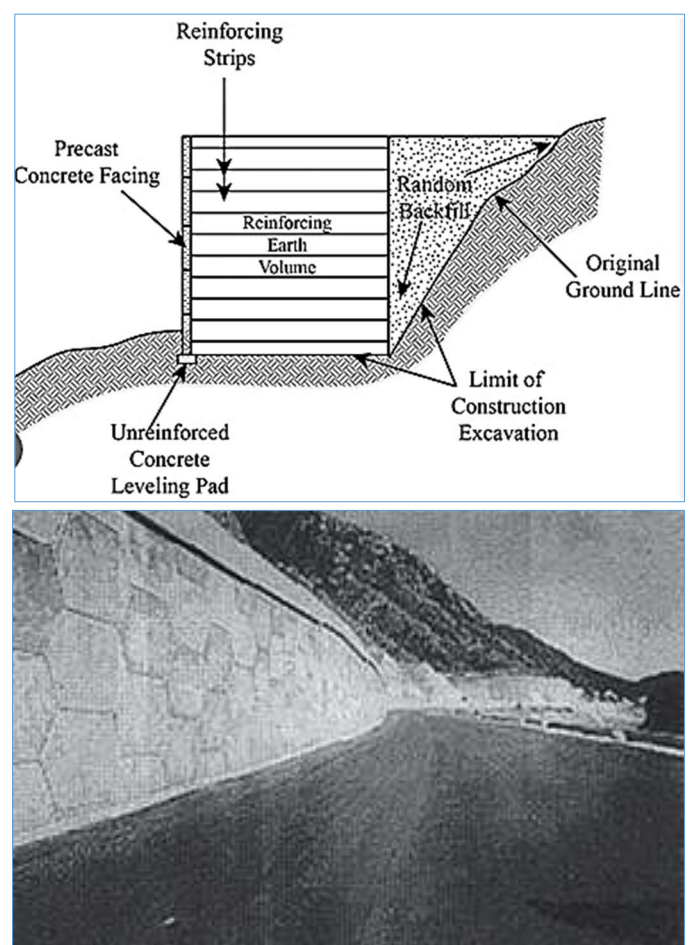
Reinforced earth wall at the lateral of the road, before slopy areas (adopted from open source)
